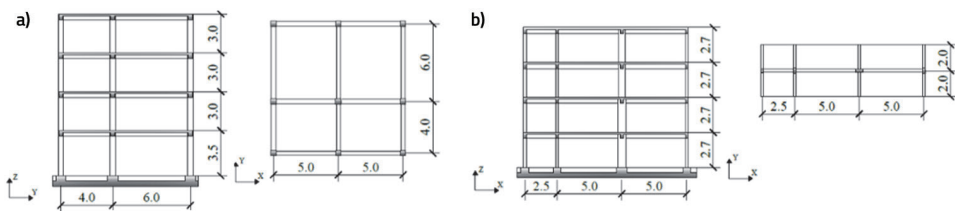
The elevation and plan views of the: a) PREC8; b) ICONS building
